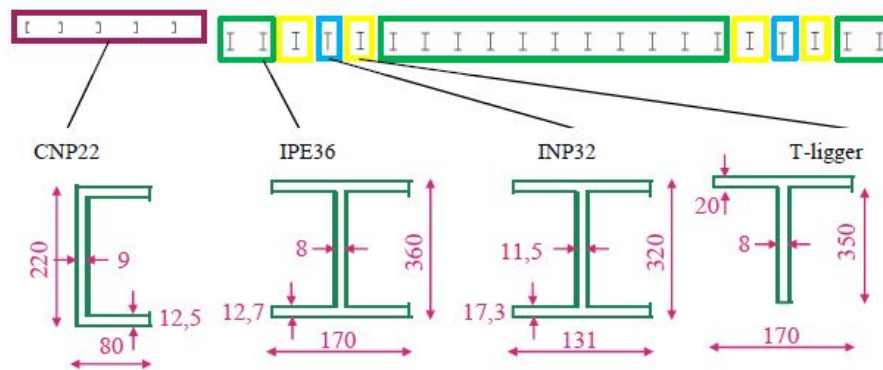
Cross- sectional properties of the longitudinal girders (Arup bv)
